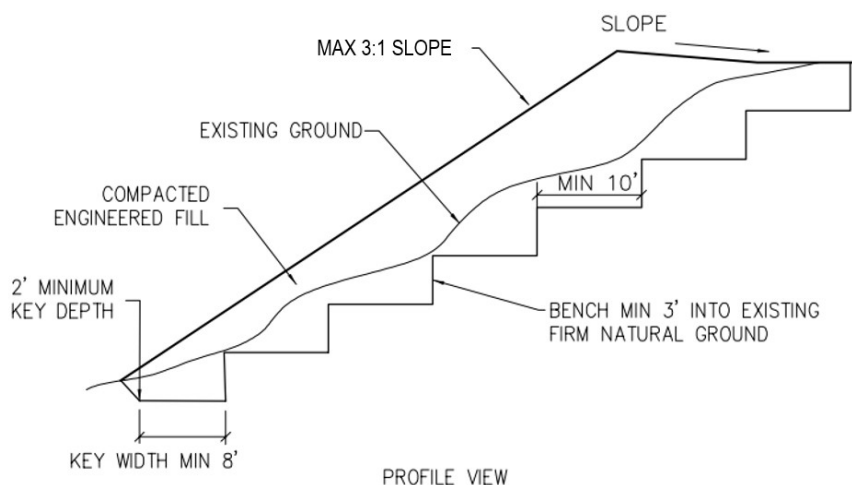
Benching detail for fill slopes greater than 5 ft
